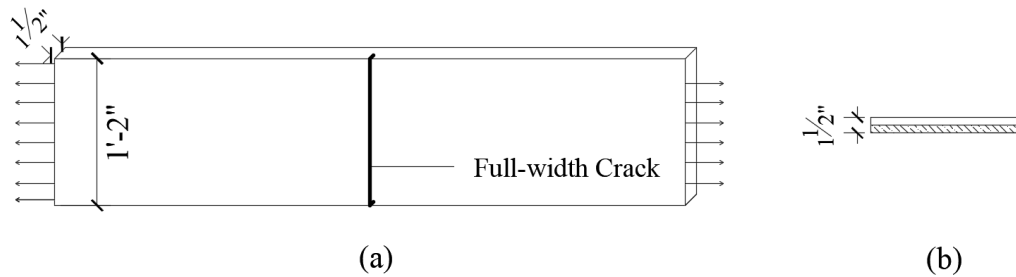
(a) Elevation and (b) Cross-sectional View of a Full-Width Crack Configuration in an Axially Loaded Plate
